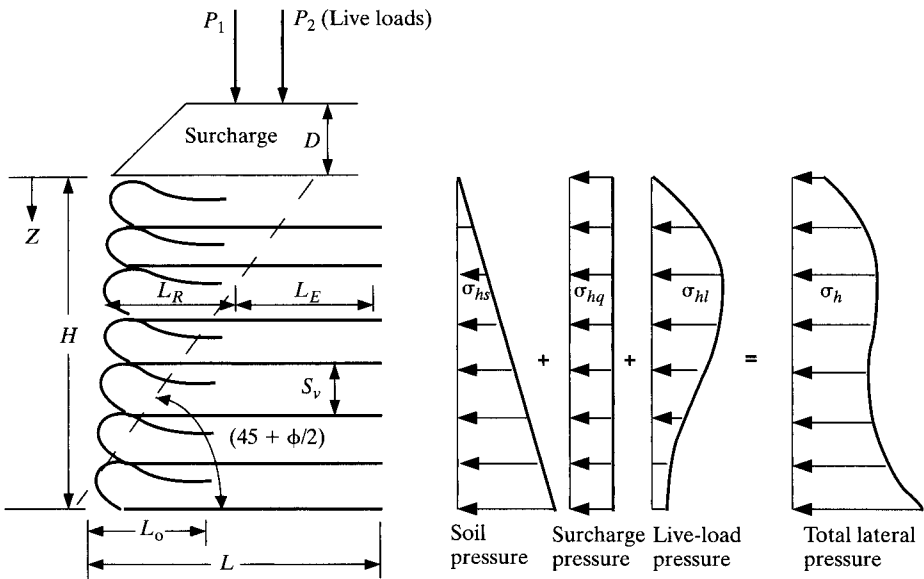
Earth pressure concepts and theory for geotextile wall design.
